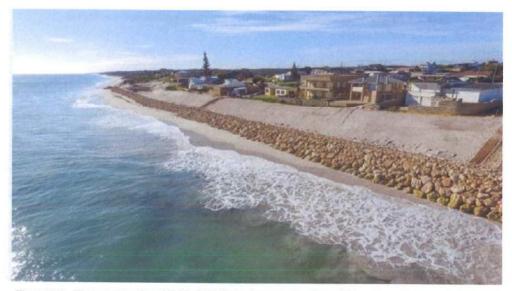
Photograph of seabird in 2016 following construction of the seawall (source: DoT)
